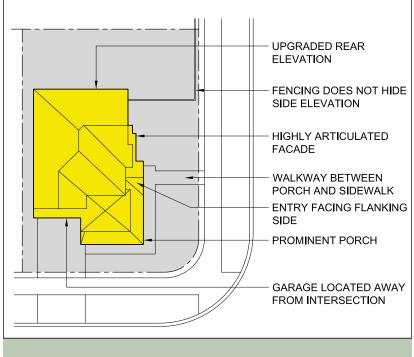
Conceptual plan view of a corner lot dwelling
